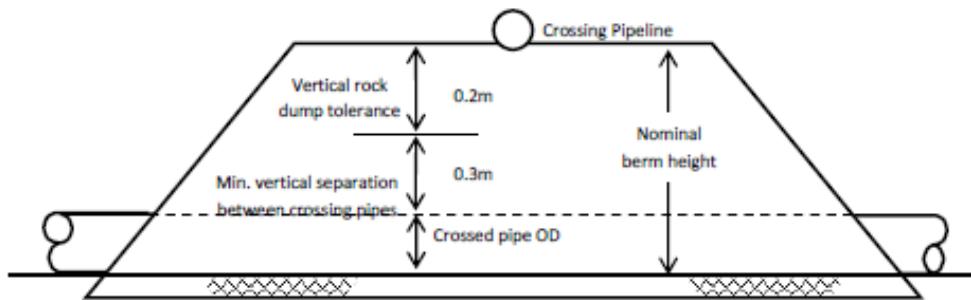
Pre-lay berm arrangement at crossings. Source: Gassco
